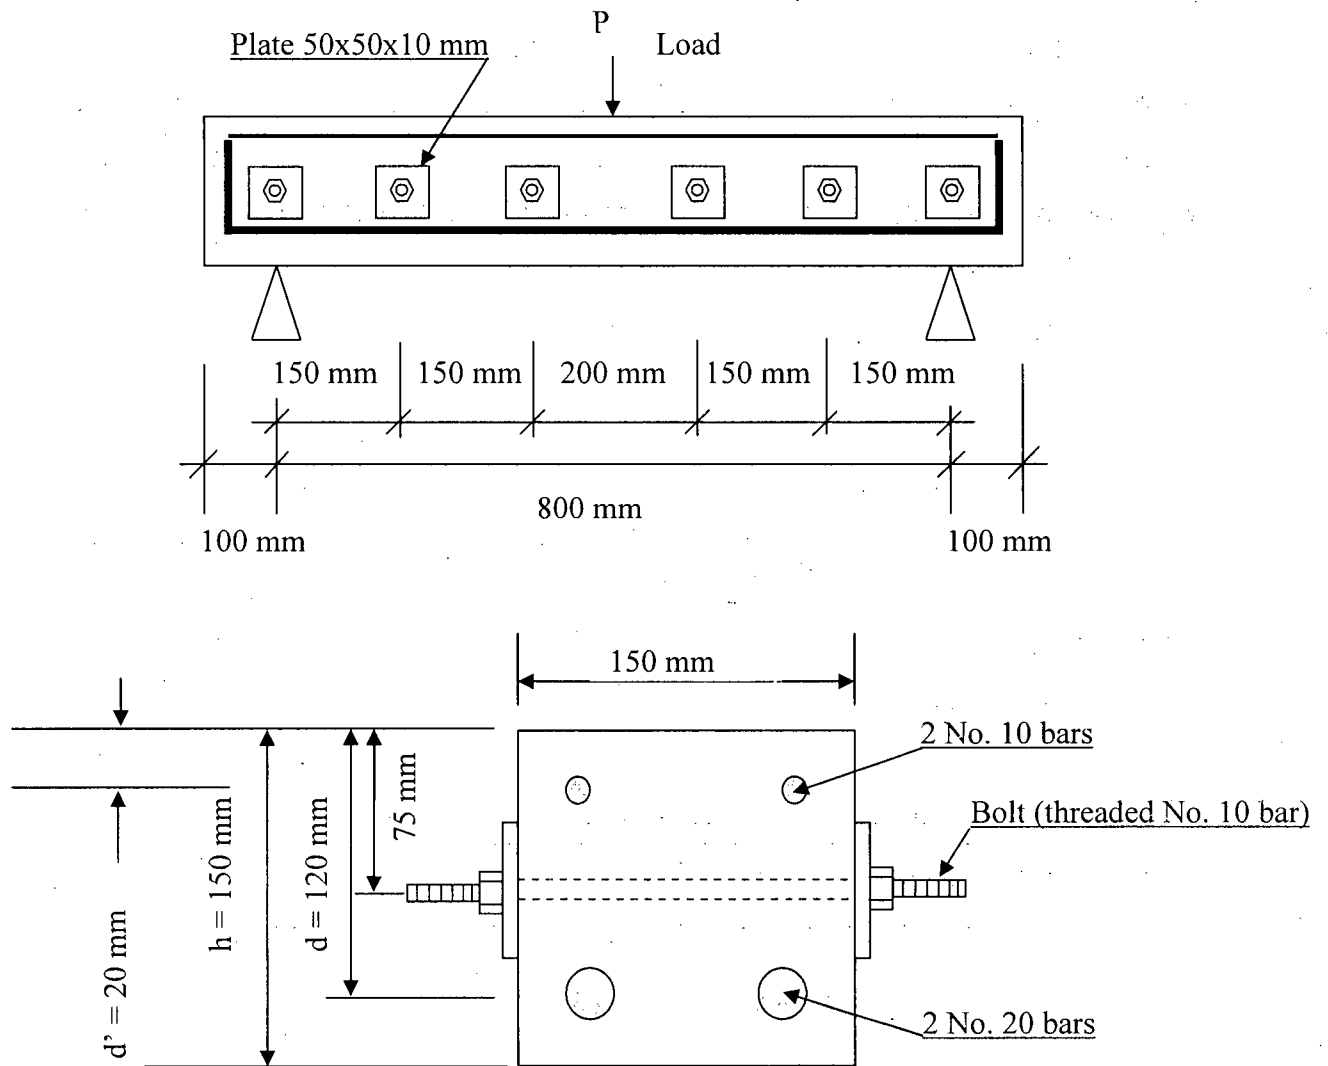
Cross-Sectional Details of RC Beam C-NS-6B
